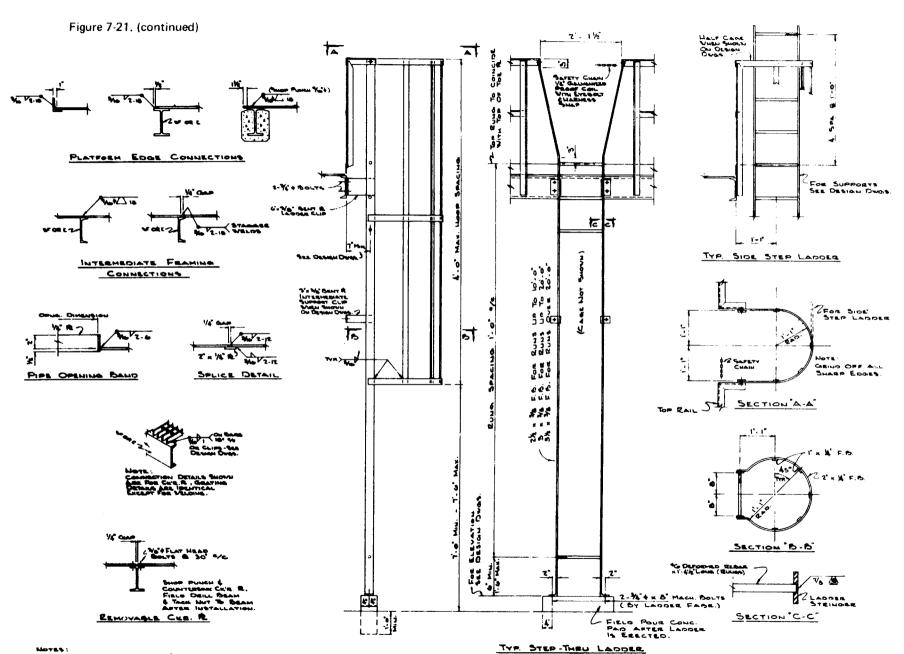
Standard stair and handrail details (courtesy of Fluor Corp.)
